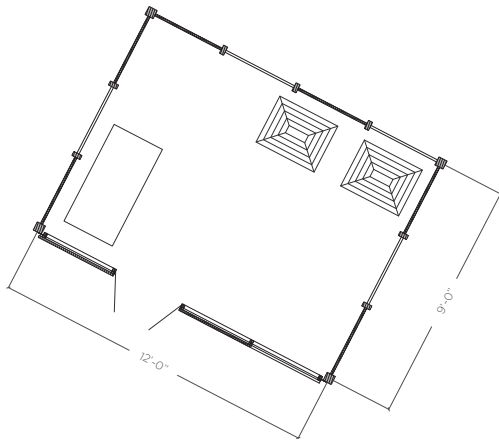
Plan of 1st generation kitchen_Phase 2 (Author)
